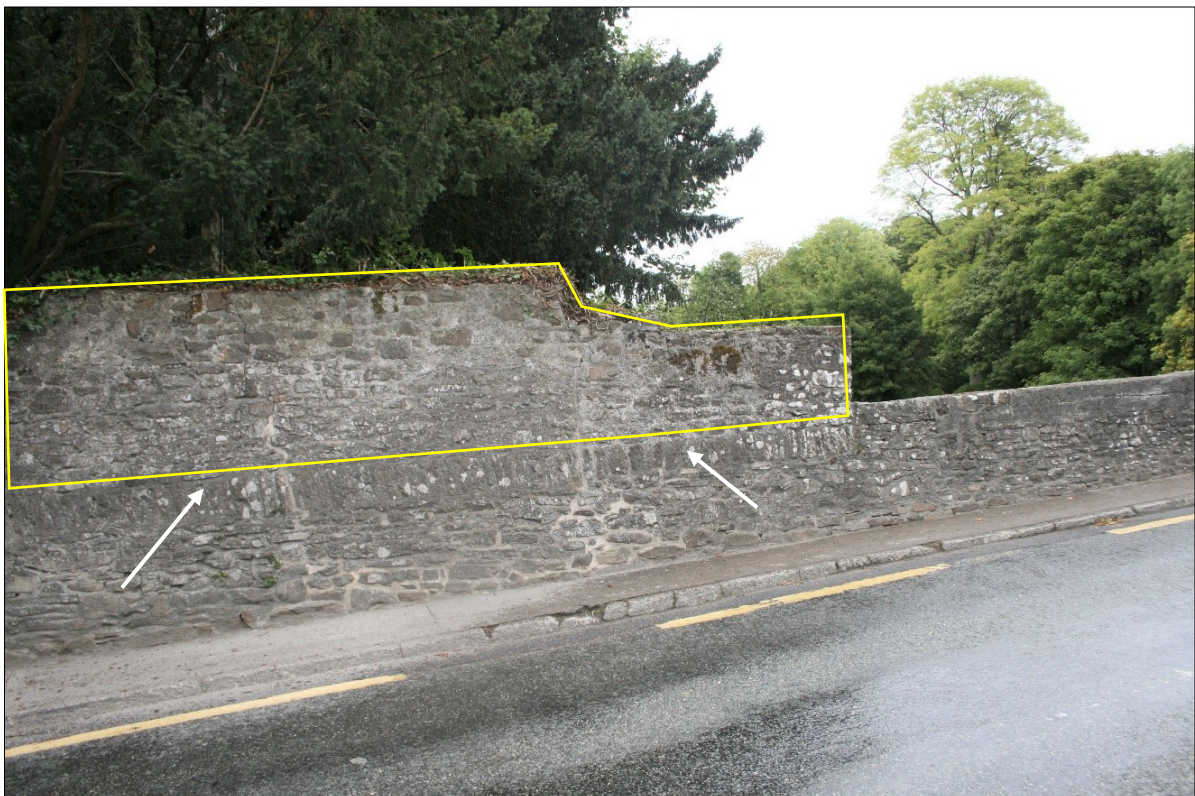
Section of walling to be removed outlined by yellow line; wall to be reduced to an earlier bridge parapet height as evidenced by the row of vertical coping stones (indicated by arrows).
